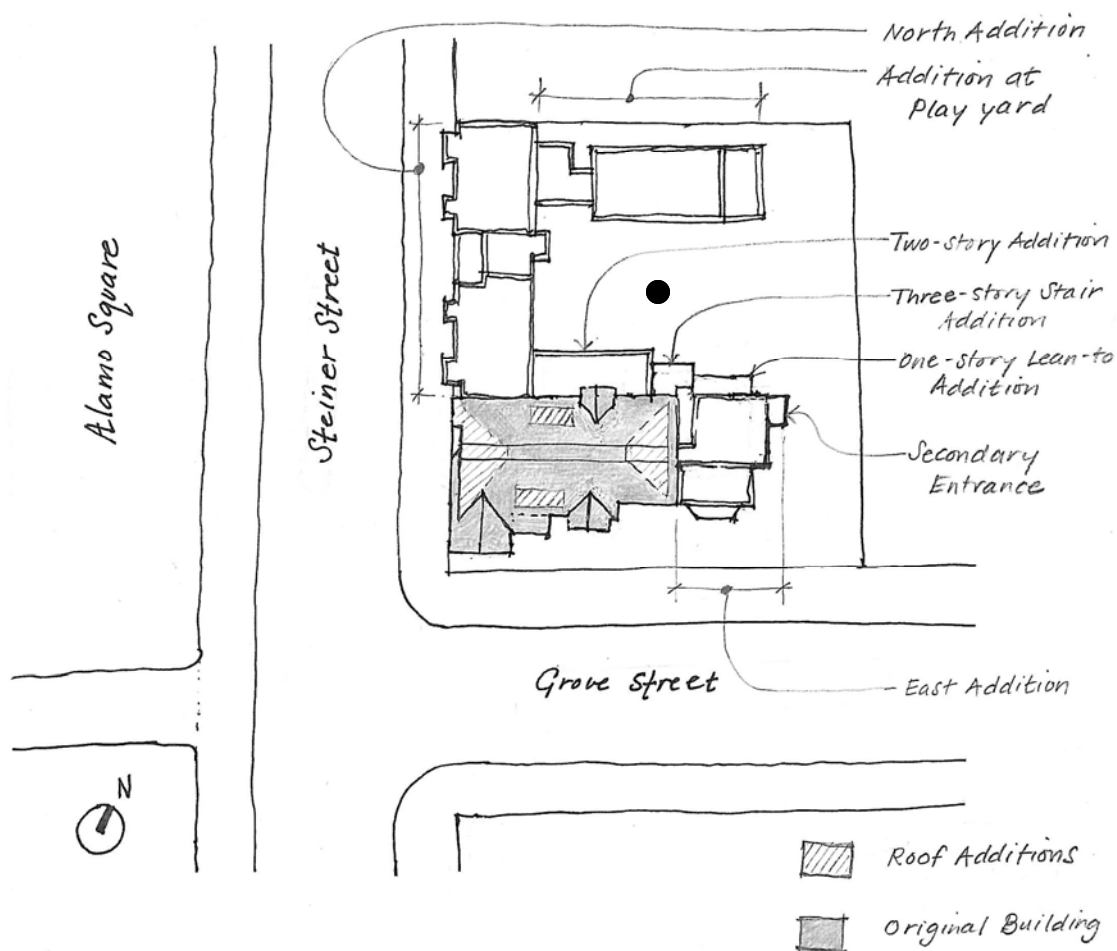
Sketch of C-shaped building plan at 940 Grove Street reflecting the general plan configuration to date. The subject lot is indicated by a dot. Knapp Architects, 2009.
